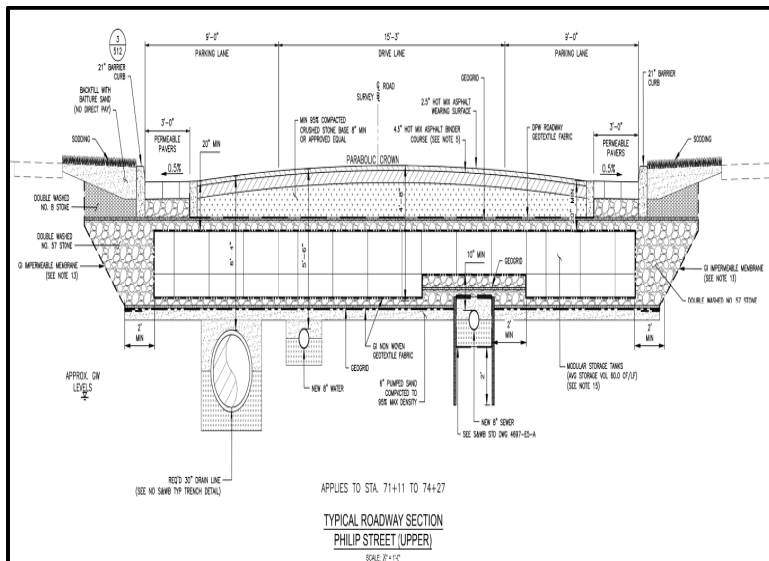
Typical Example Cross-Section of the Proposed Complete Streets Design
